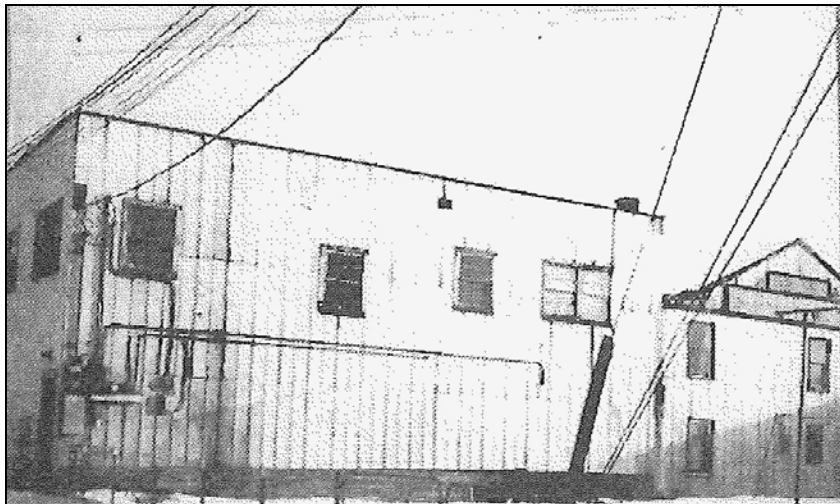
(Right photo) West elevation at rear of building, date unknown.
